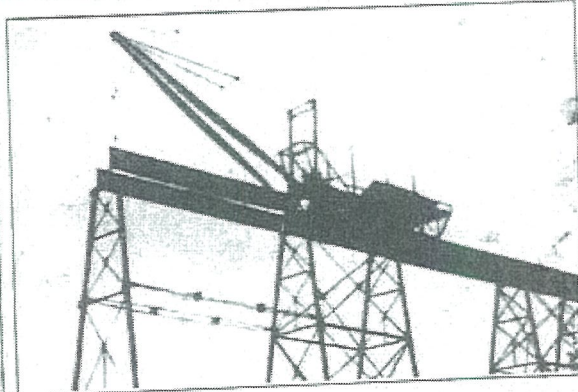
100 ft. Girder Ready to Place. Erection Struts in Position.
